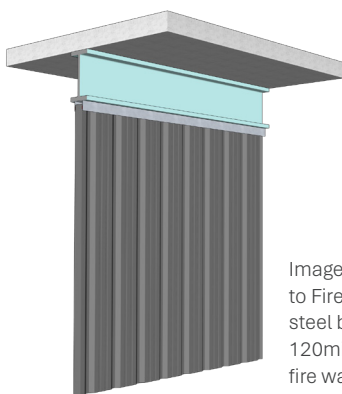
Korok wall to Fireshield® coated steel beam - up to 120mins FRR 2 way fire wall.
